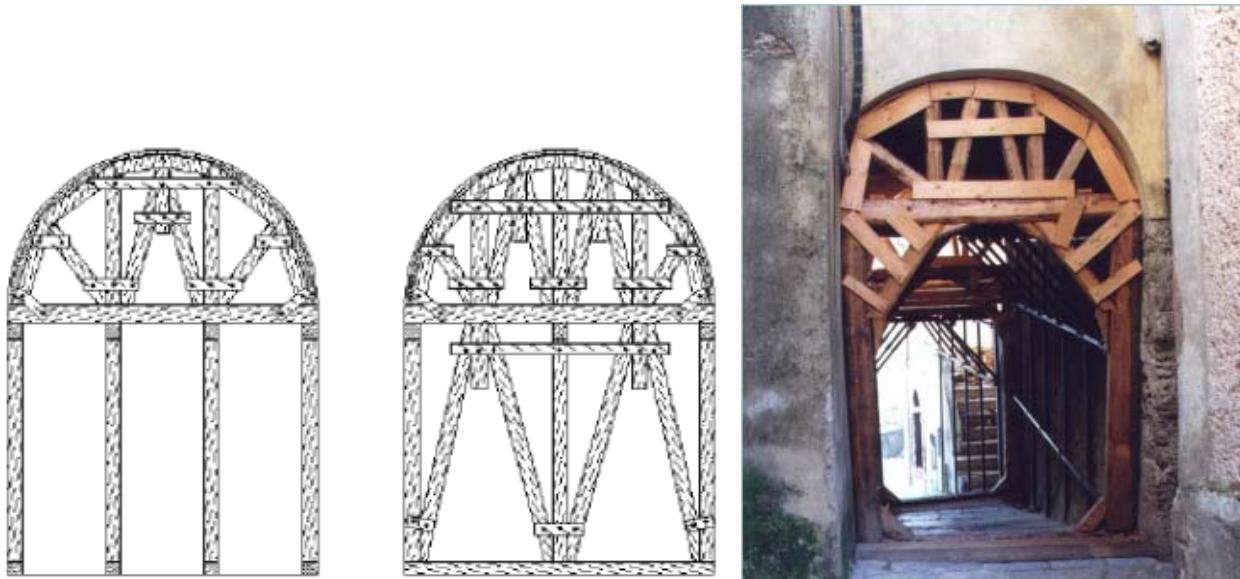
Propping and bracing arched openings (SSN-DPC, 2005)
